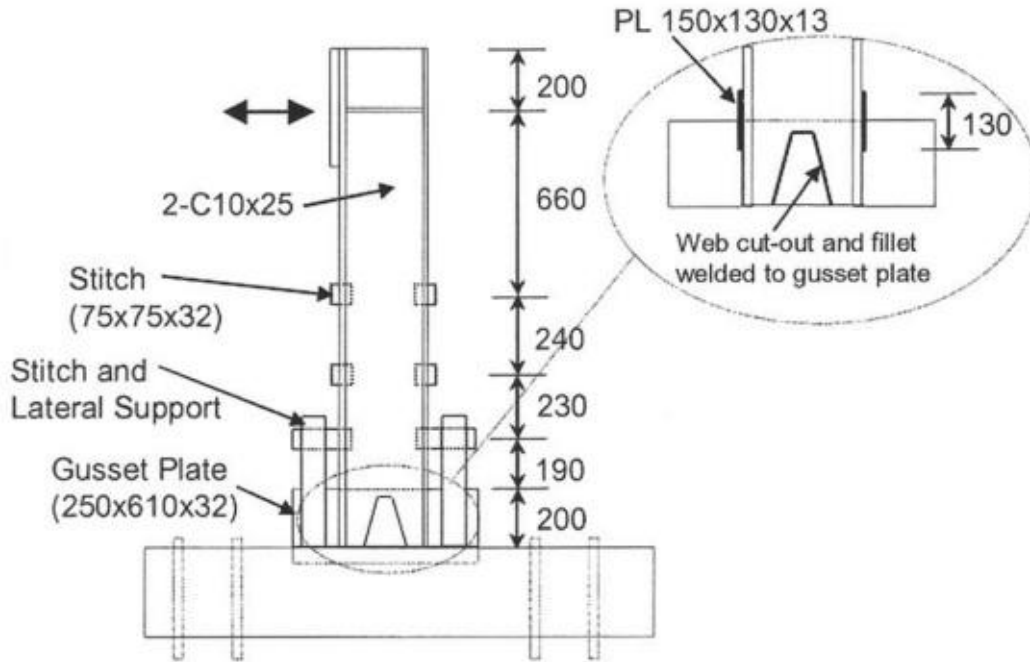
Connection details of Specimen 6 (Parra-Montesinos et al, 2006)
